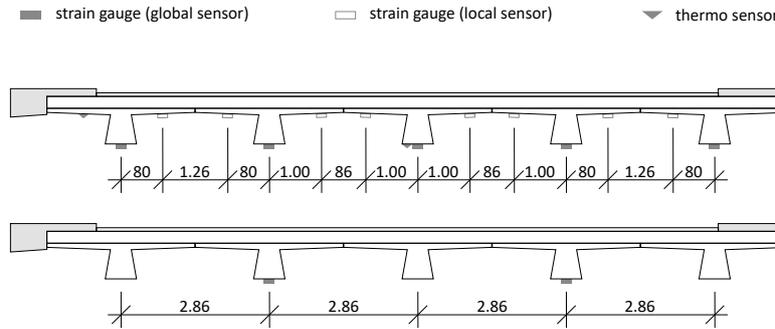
Sensor locations within bridge section of span no. 4 (top) and remaining spans (bottom).
